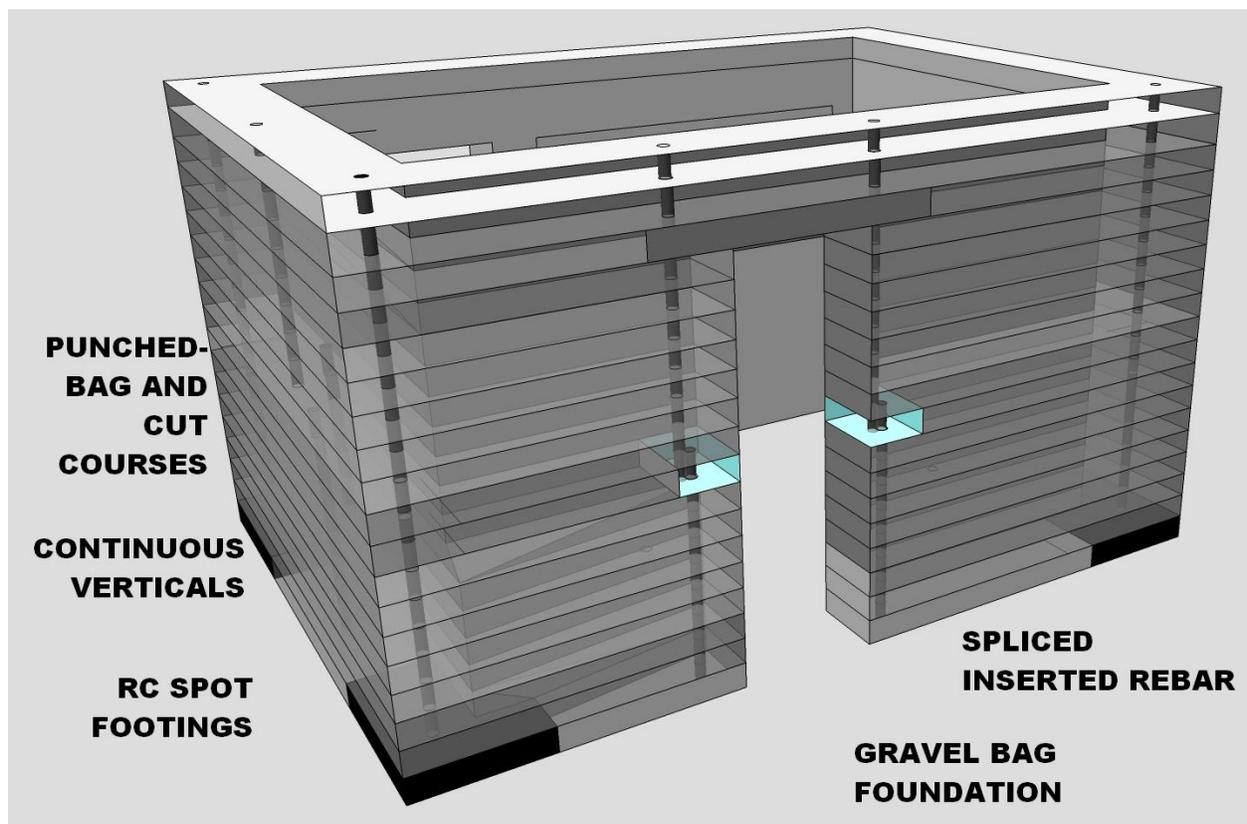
Strengthen corners with vertical rebar that is base-anchored in spot reinforced concrete footings. Insert spaced lap rebars at other locations on gravel bag foundations.
